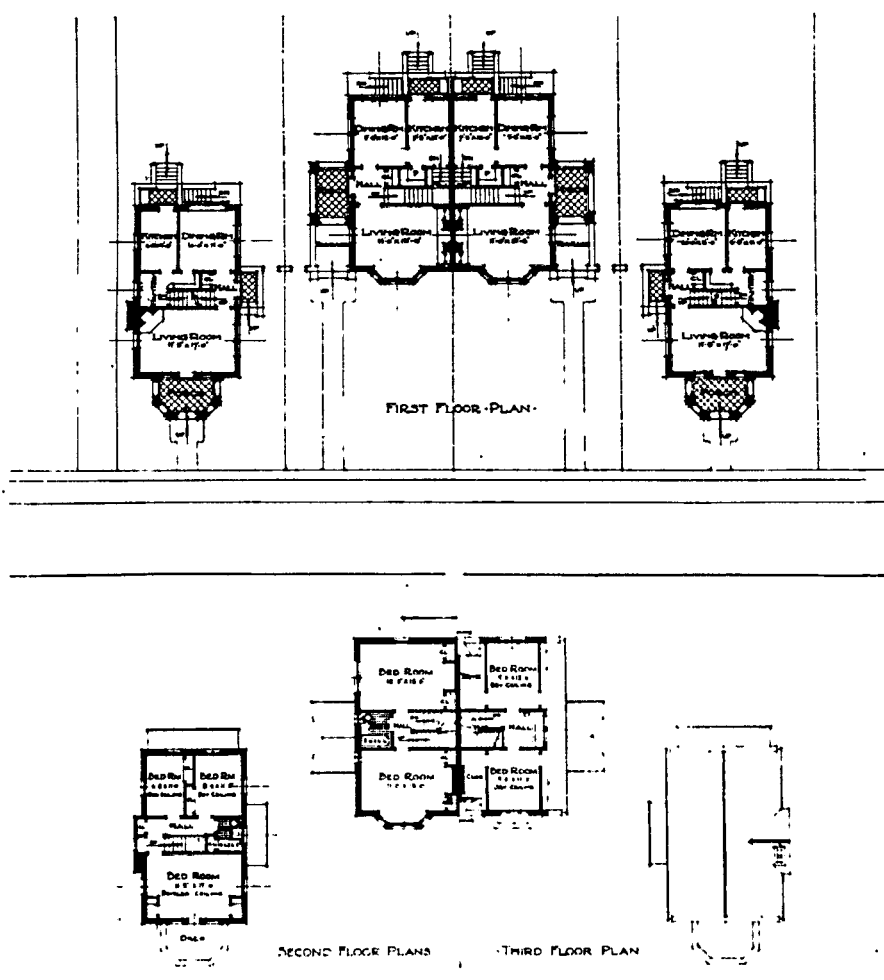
Group XVIII-B. "Two Detached, Two Semi-Detached Single Family Houses." Grosvenor Atterbury, Architect.
